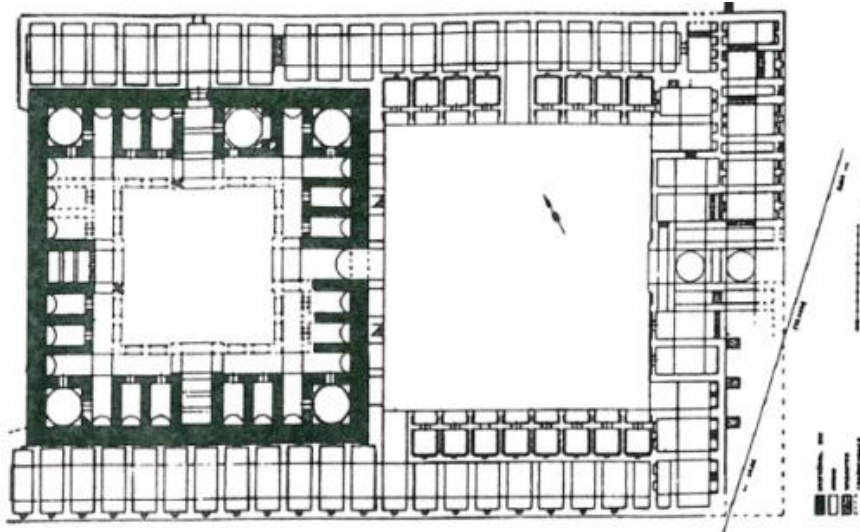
Tolab Stone Caravanserai plan (source: Iranian caravanserai book: 476)
